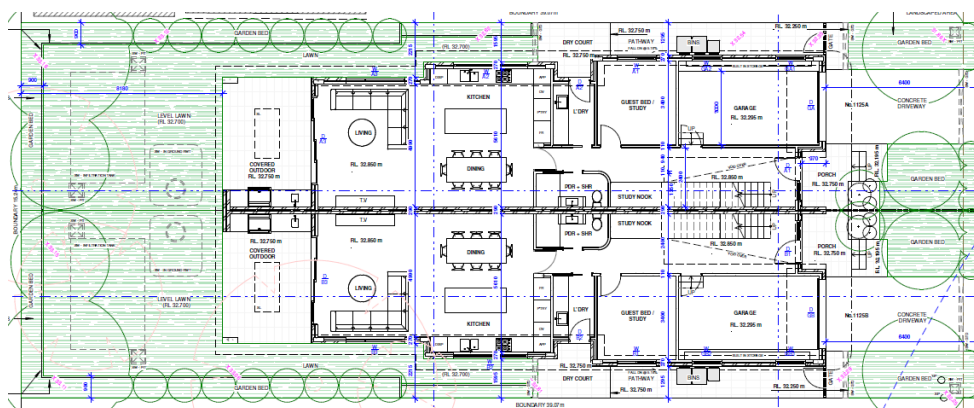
Proposed ground floor plan - 1125 Anzac Parade, Matraville (Source: Cantilever)
